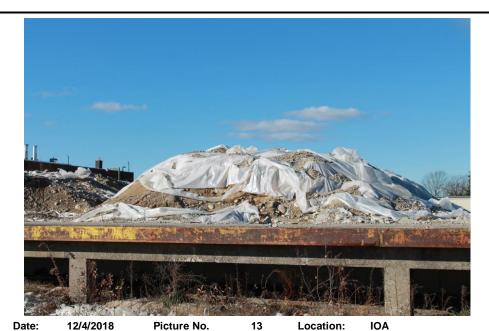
Picture No. Date: 12/4/2018 IOA Comment: Soil piles south of Building 140, looking northeast
